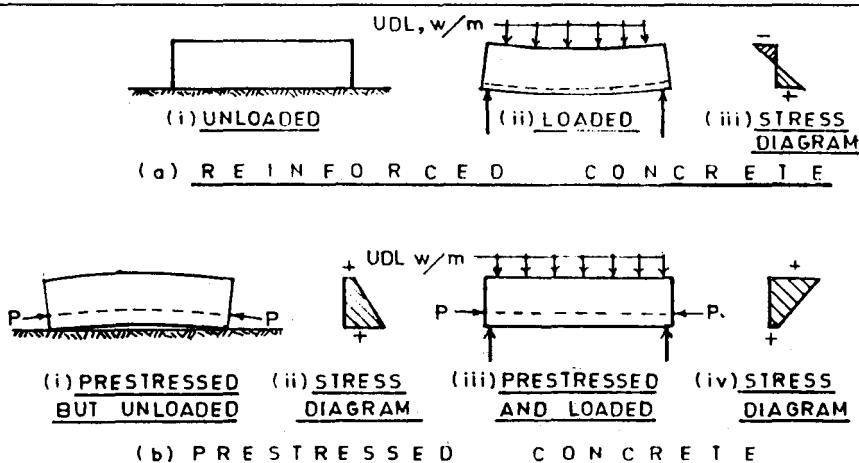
STRESSES IN REINFORCED AND PRESTRESSED CONCRETE BEAMS
